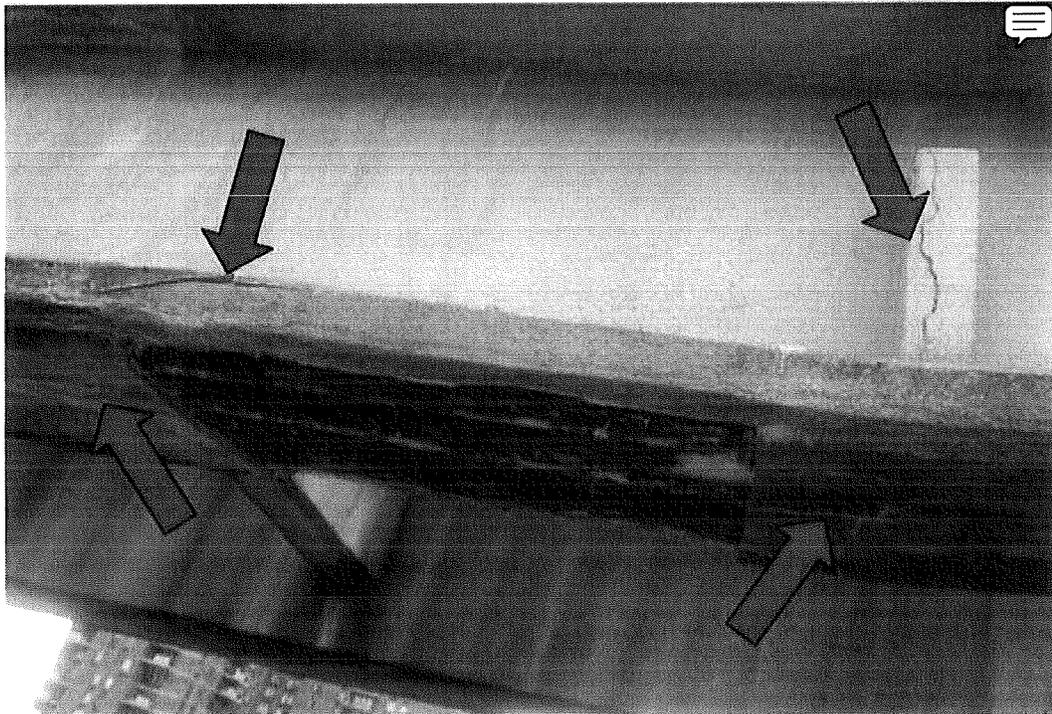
Hollow sounding encasement between Column Lines 1 and 3, along Column Line U6 at Parking Level 6. (Note the cracks at arrows). (Approx. 44 SF)
